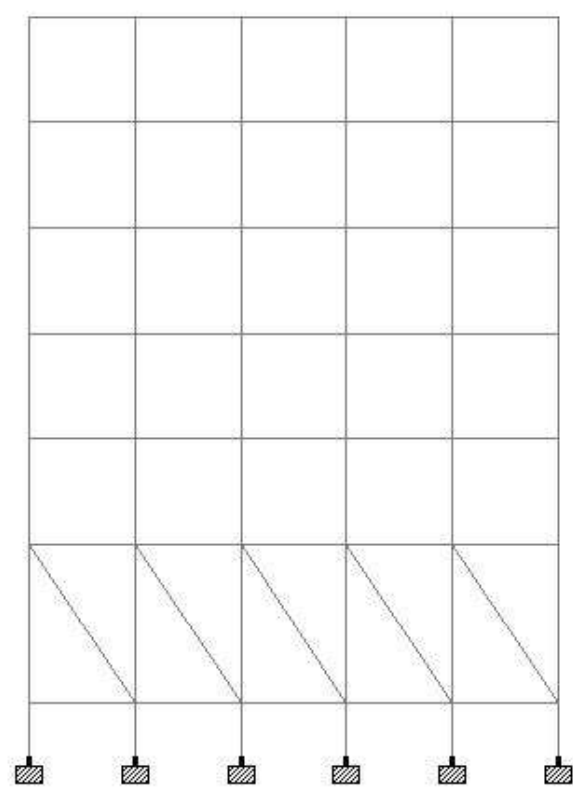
Typical example of equivalent diagonal struts in horizontal pattern (General)
